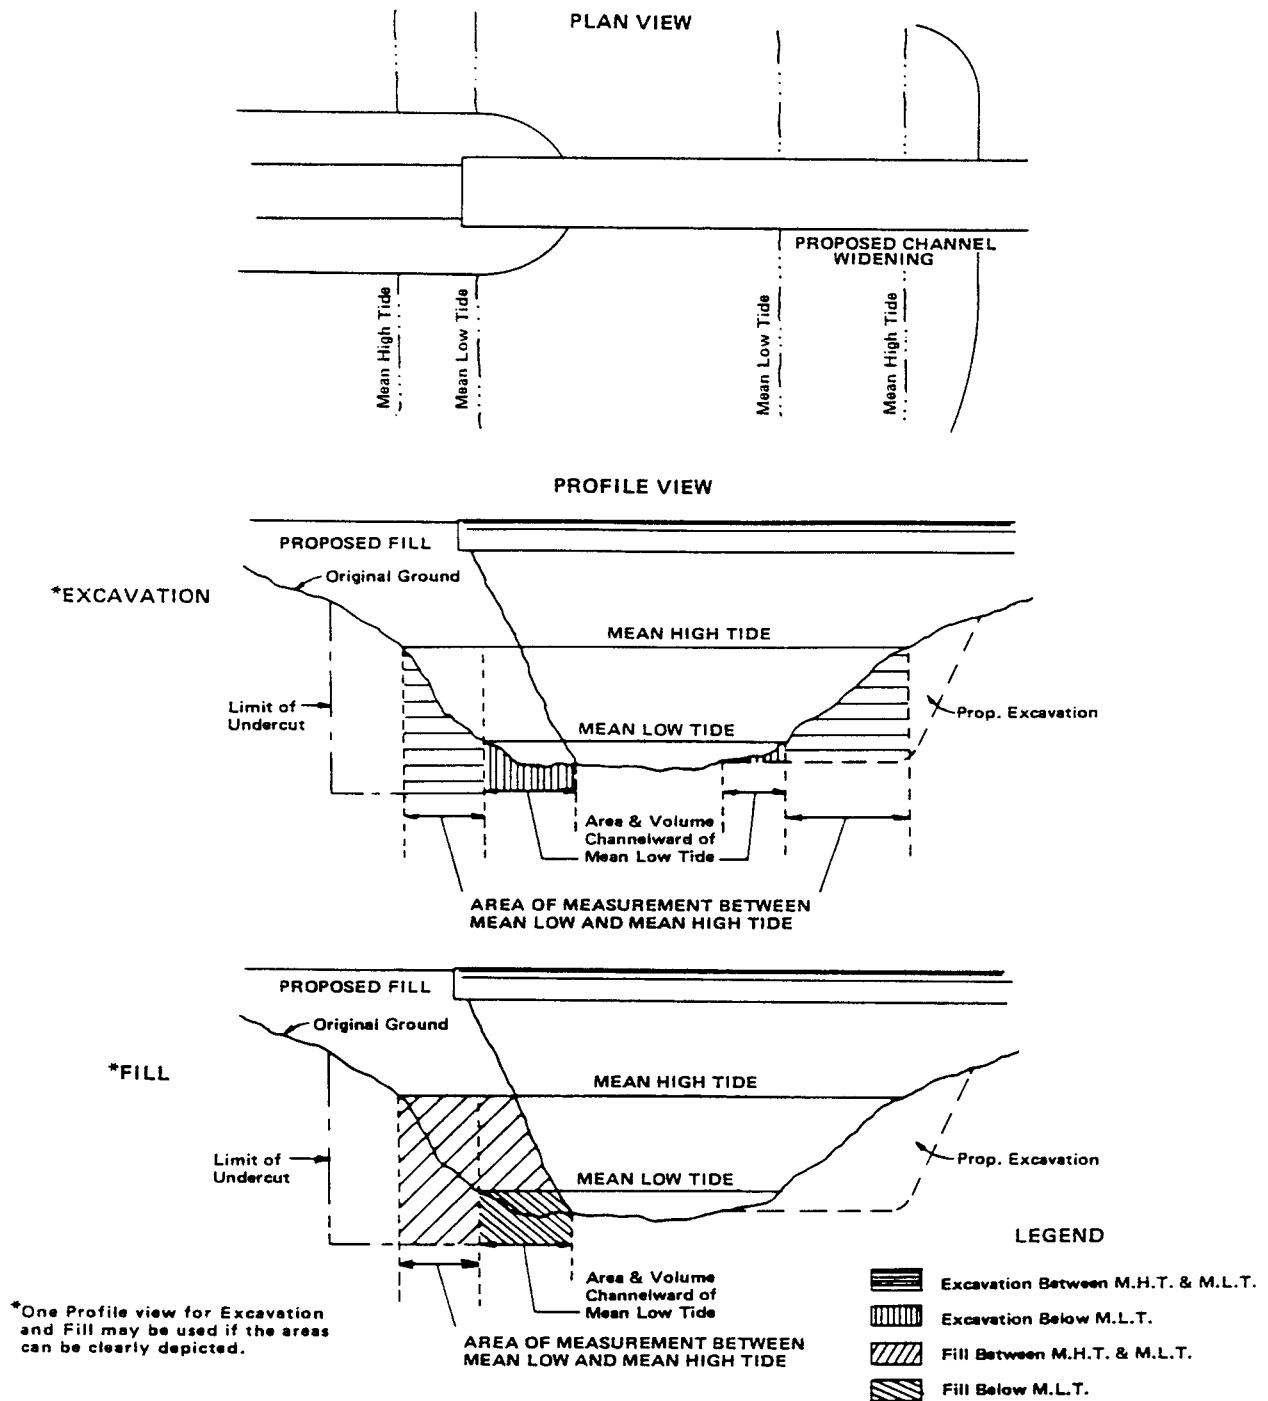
MEASUREMENT OF EXCAVATION AND FILL AREAS BETWEEN MEAN LOW AND MEAN HIGH TIDES
